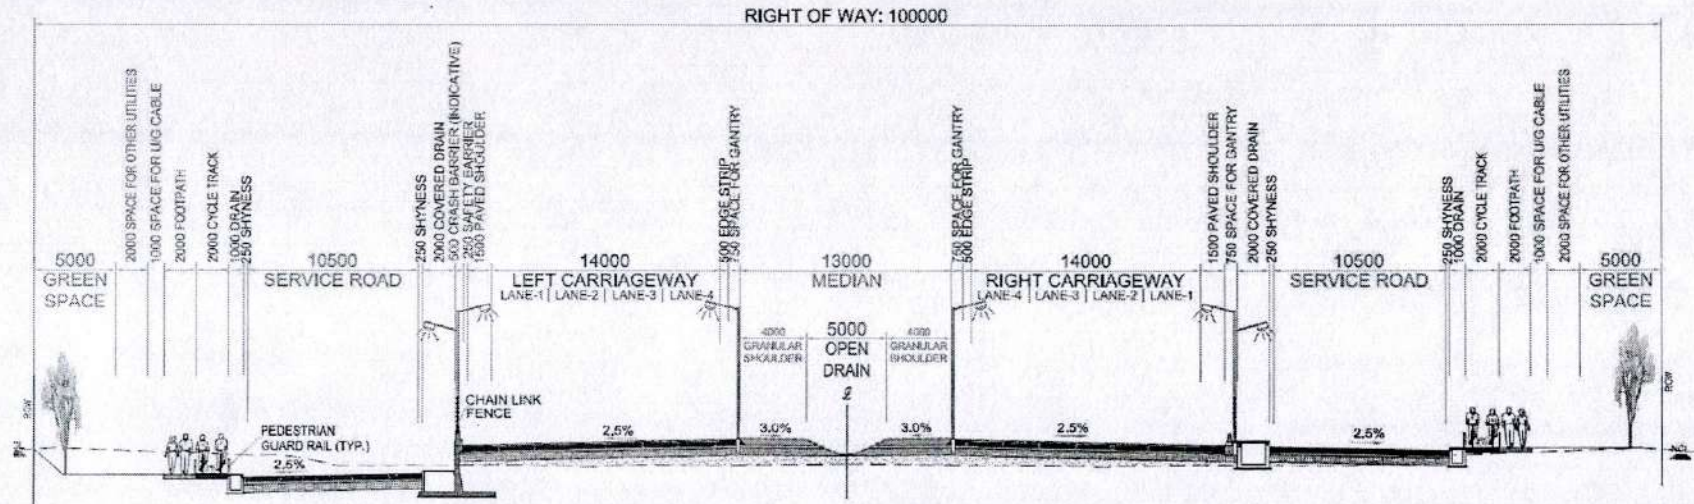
Typical cross section of PRR with LSR lower than Main road
